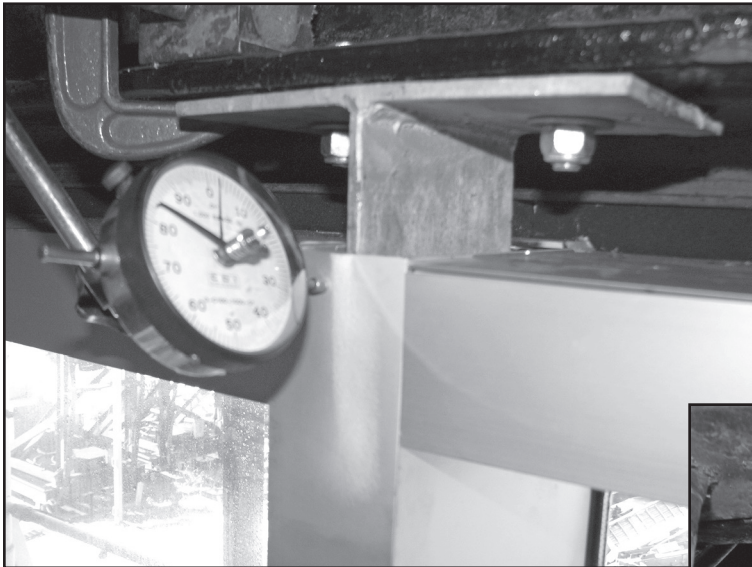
Structural failure at mullion connection of stick-framed curtain wall.
